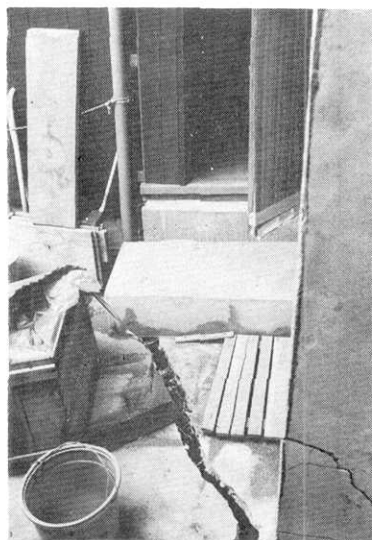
Destruction of a house and cracks at loc. S-26, showing right lateral displacement.
